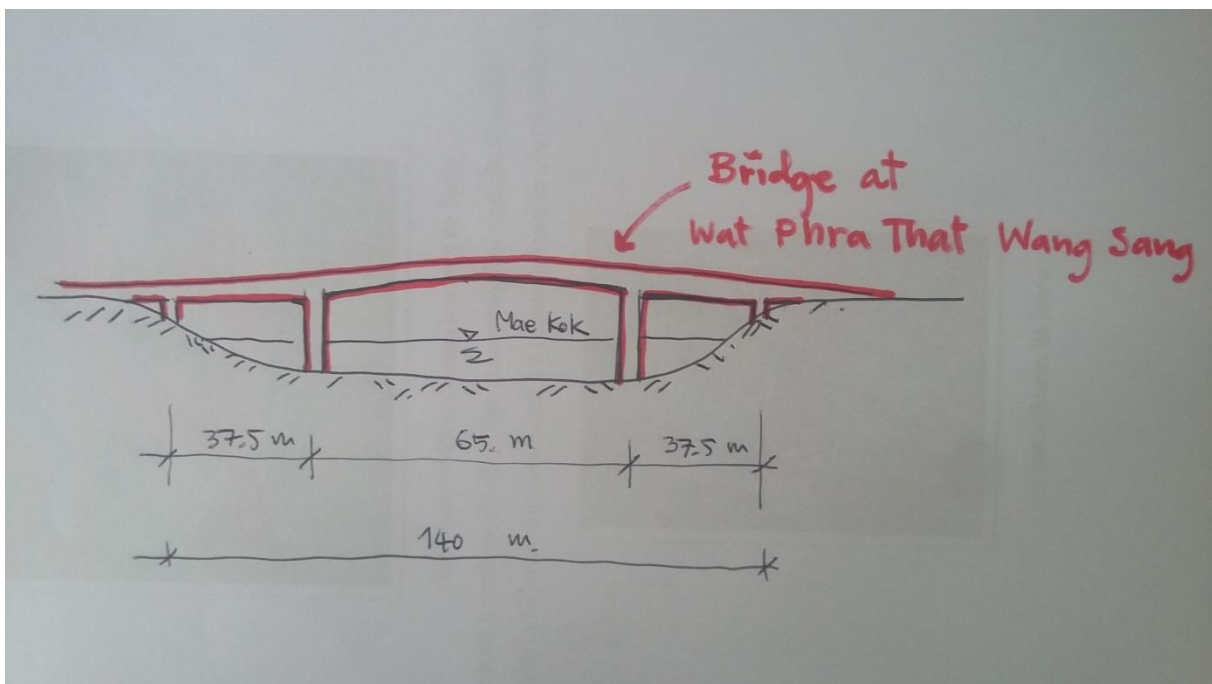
Bridge near Wat Phra That Wang Sang (sketching)
